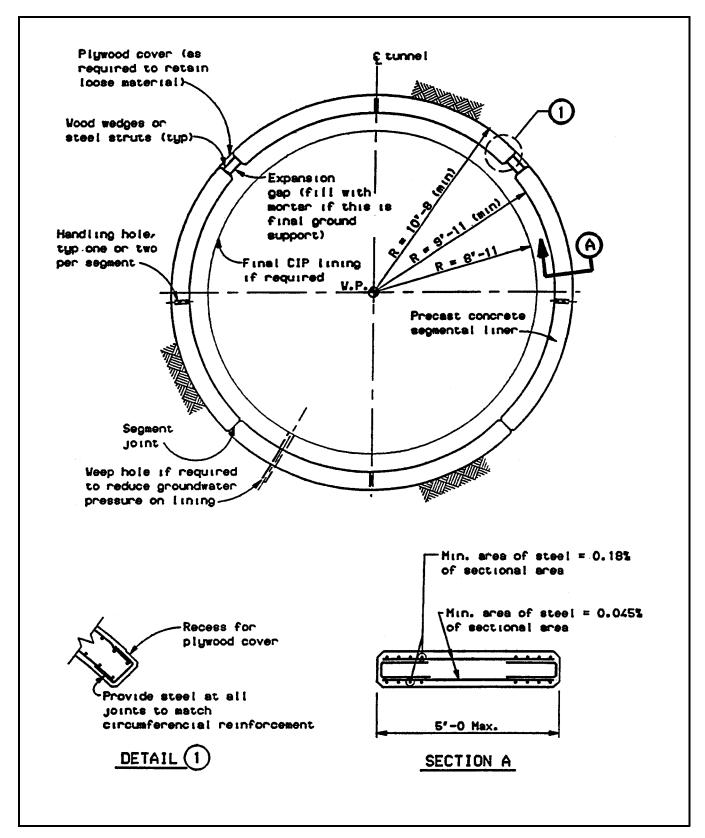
Simple expanded precast concrete lining used as initial ground support or as final ground support
